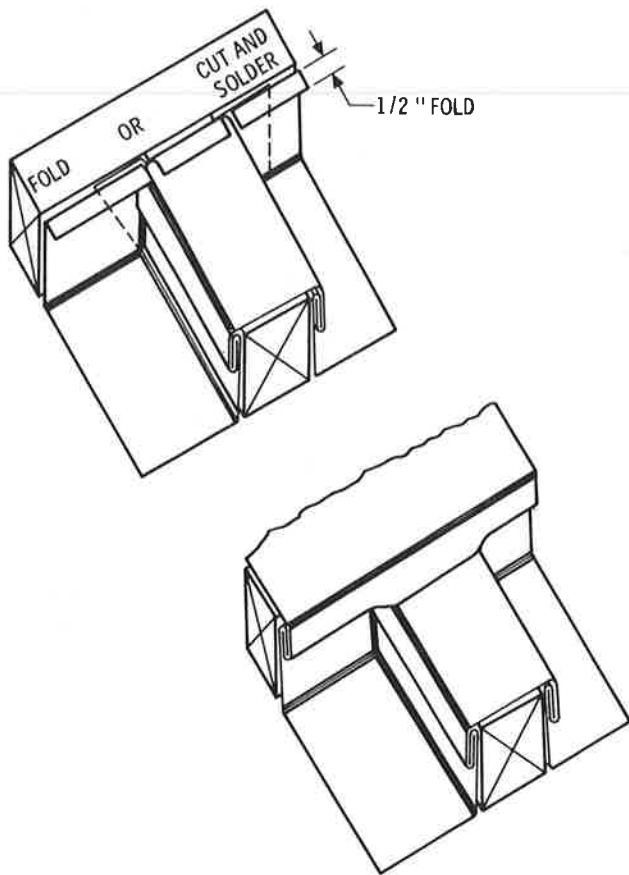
SHEETWORK DETAILS AT RIDGES AND HIPS
